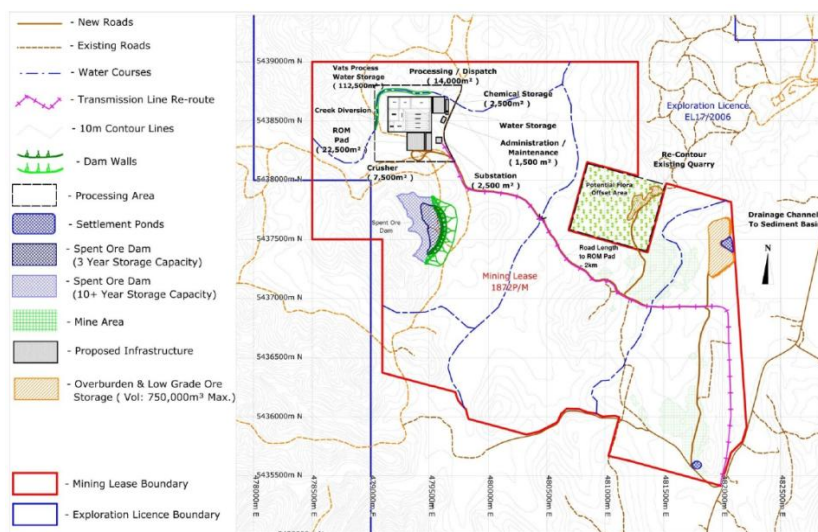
Site Plan for the Proposed Barnes Hill Mine
